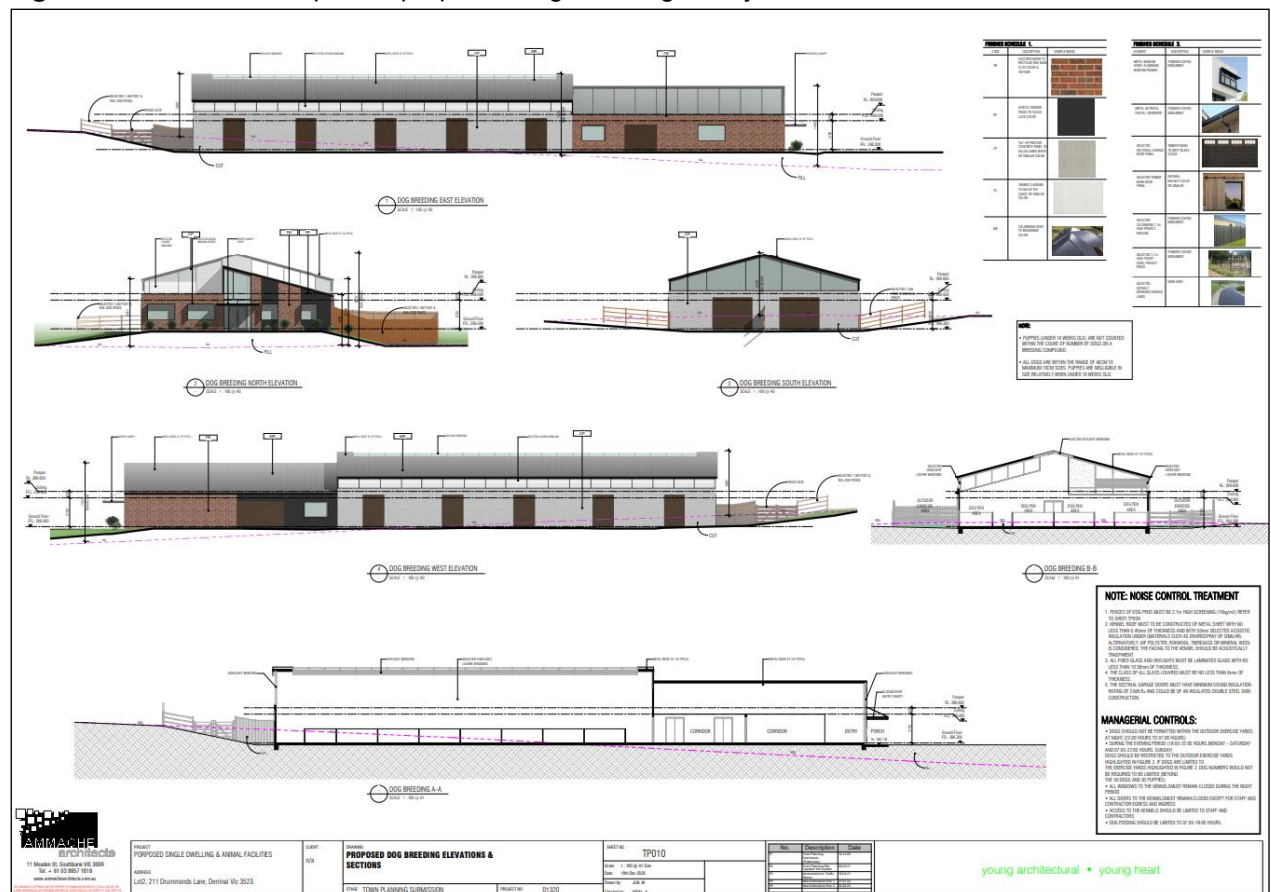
Elevation plans and schedule of materials for proposed dog breeding facility.
